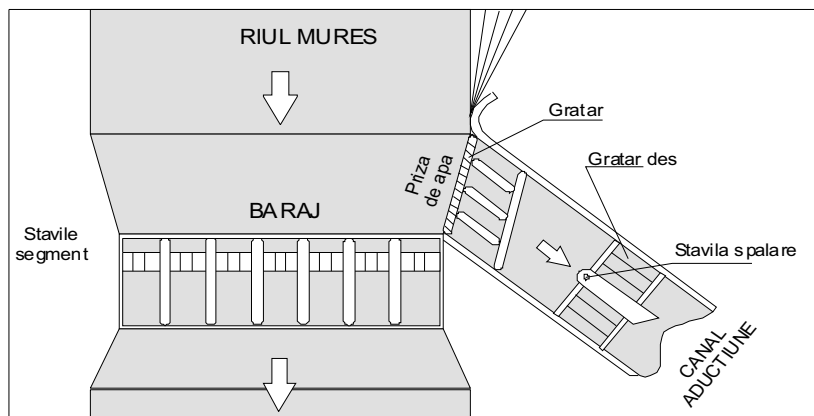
Hydro technical works at Mintia Thermal Power Plant
